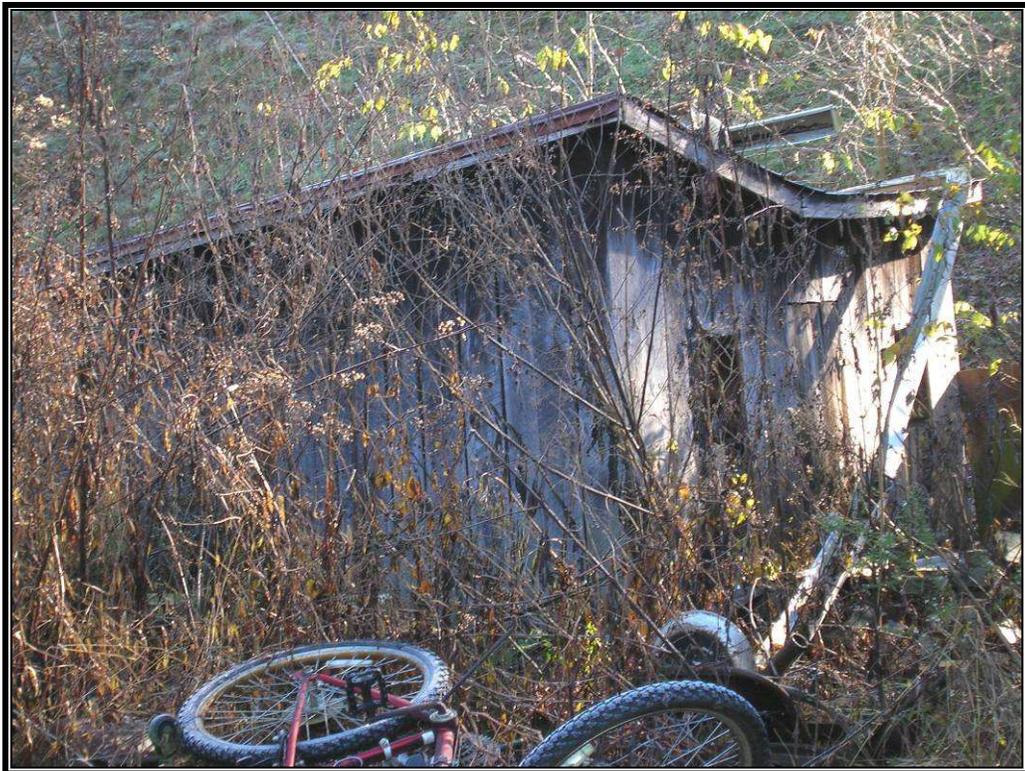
Site 100, Shed-roof outbuilding in deteriorating condition (Resource F).
